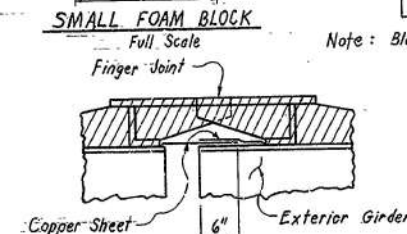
DETAILS OF CLOSED CELL FOAM STRIP FOR FINGER JOINTS OF TRUSS UNITS
